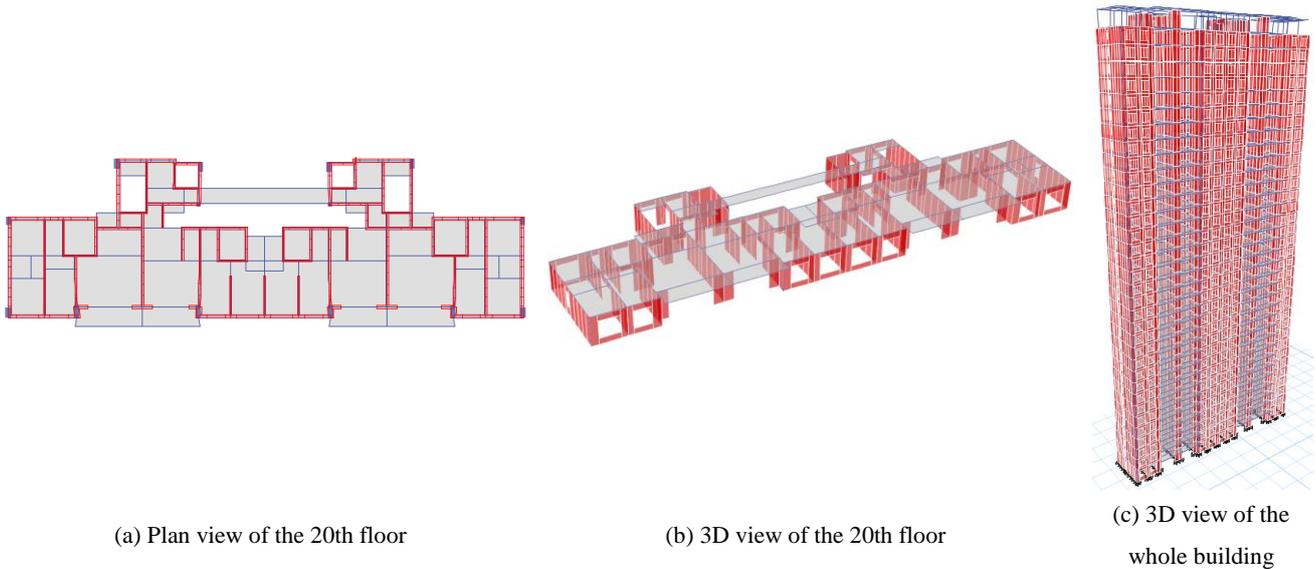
Ground structure and discretization (wall element length = 1 m) of the shear walls for model-2
